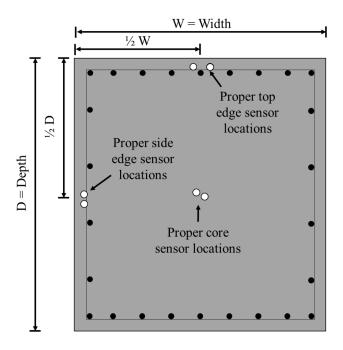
Proper temperature sensor placement on a rectangular bent cap cross section (example of a vertically oriented cross section)
